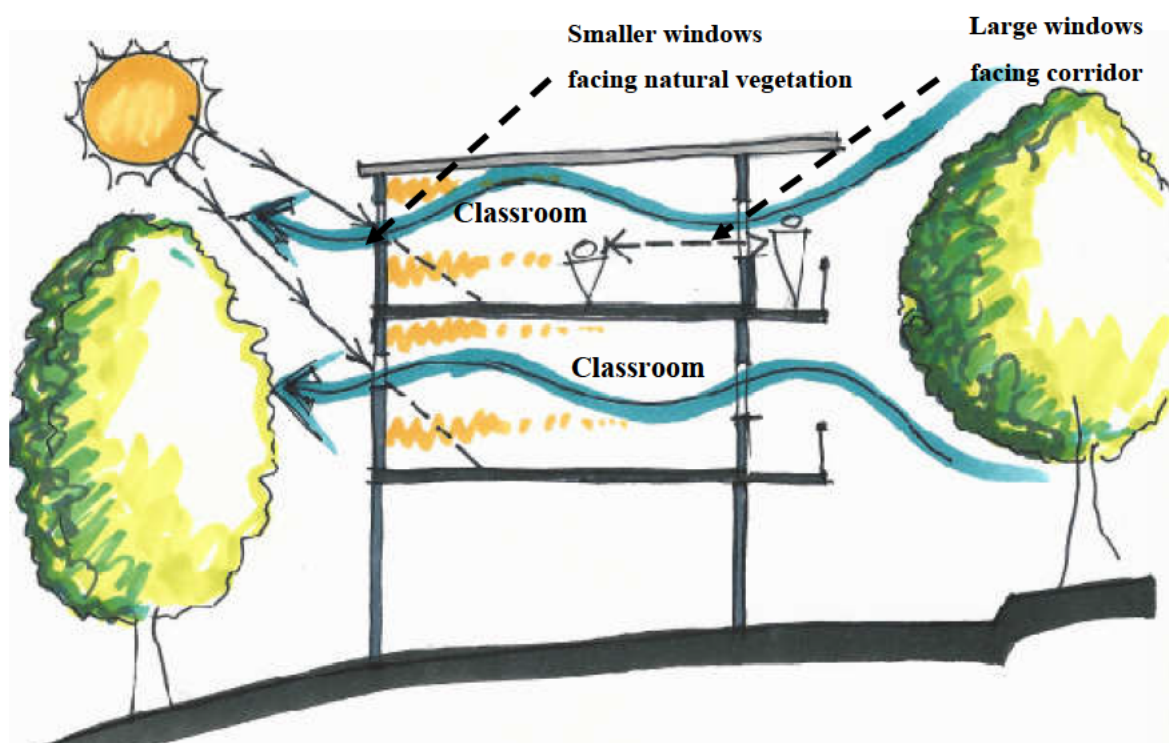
Cross Section showing impact of windows (Source: Author 2023)
